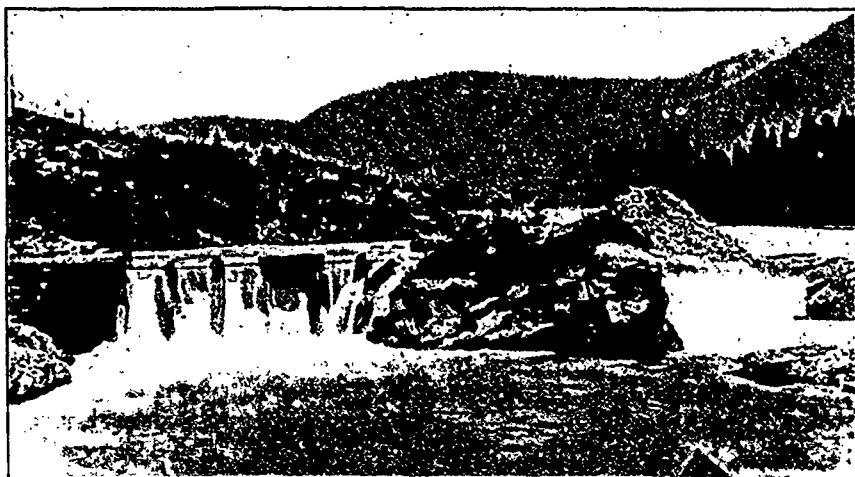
WOODEN DAM, SITUATED ABOVE CONCRETE DAM.
